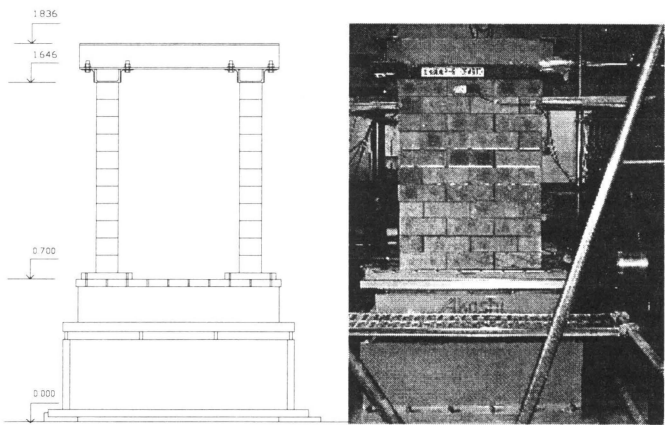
An eleven layers SRB-DUP masonry wall specimen
